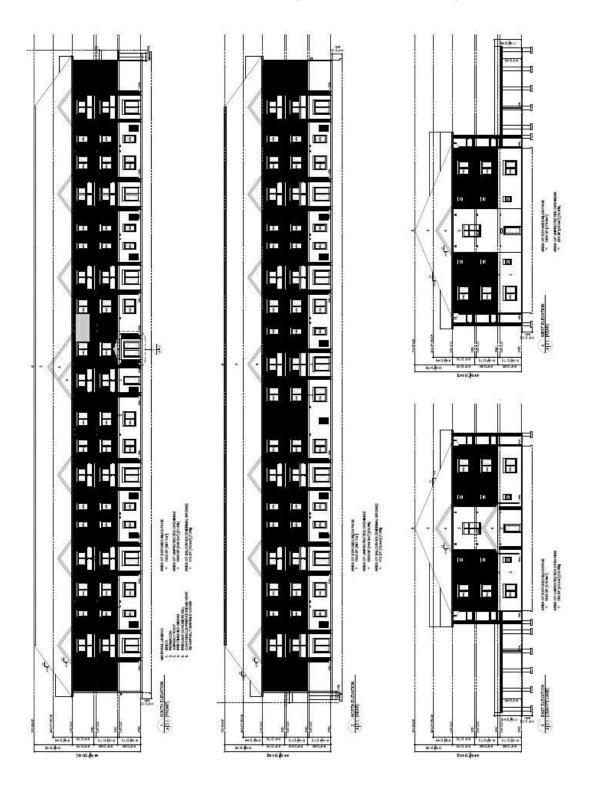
Exhibit B – Site Plan, Building Elevations, Page 5 of 5
